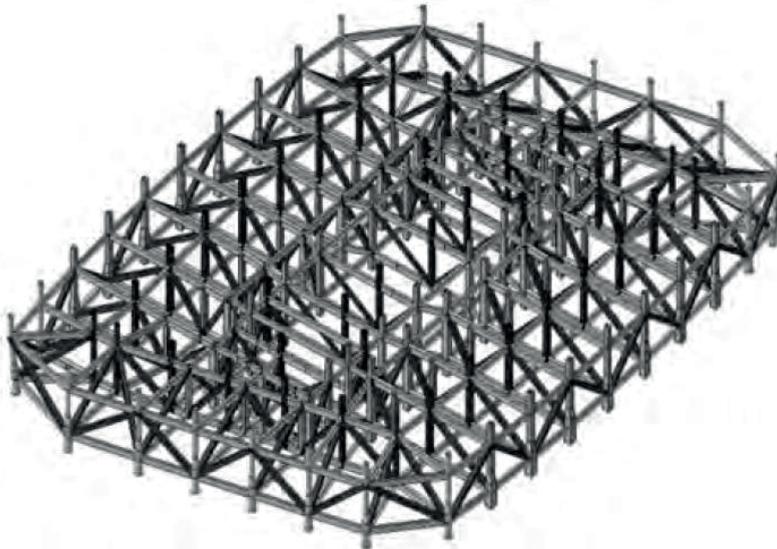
Toranomom Hills: Structural spatial truss on the 36th floor [12]
